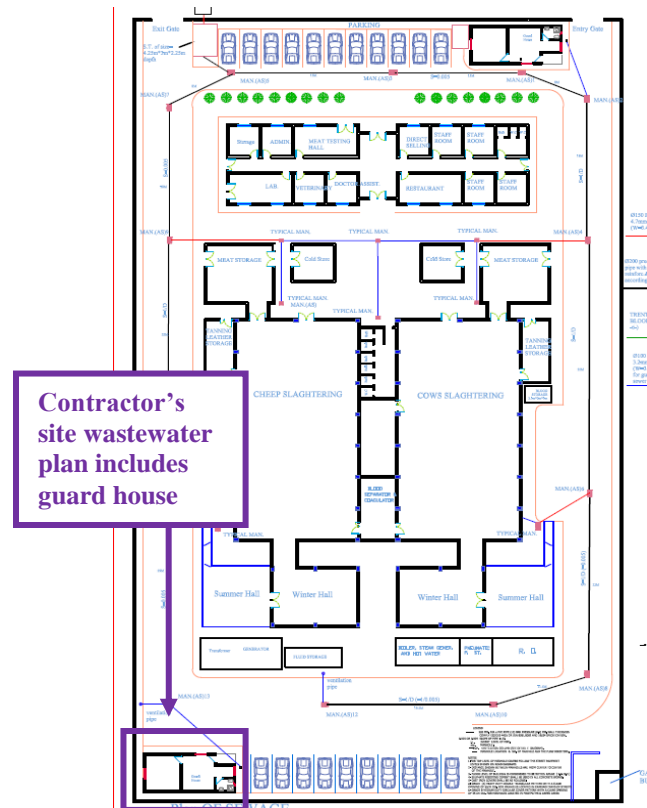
Site wastewater plan includes guardhouse (Courtesy of GRS)
